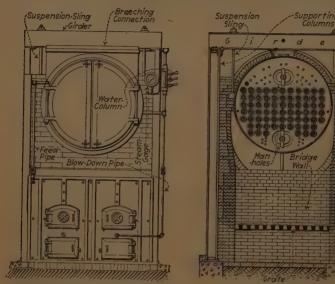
Front elevation of horizontal return-tubular boiler.
